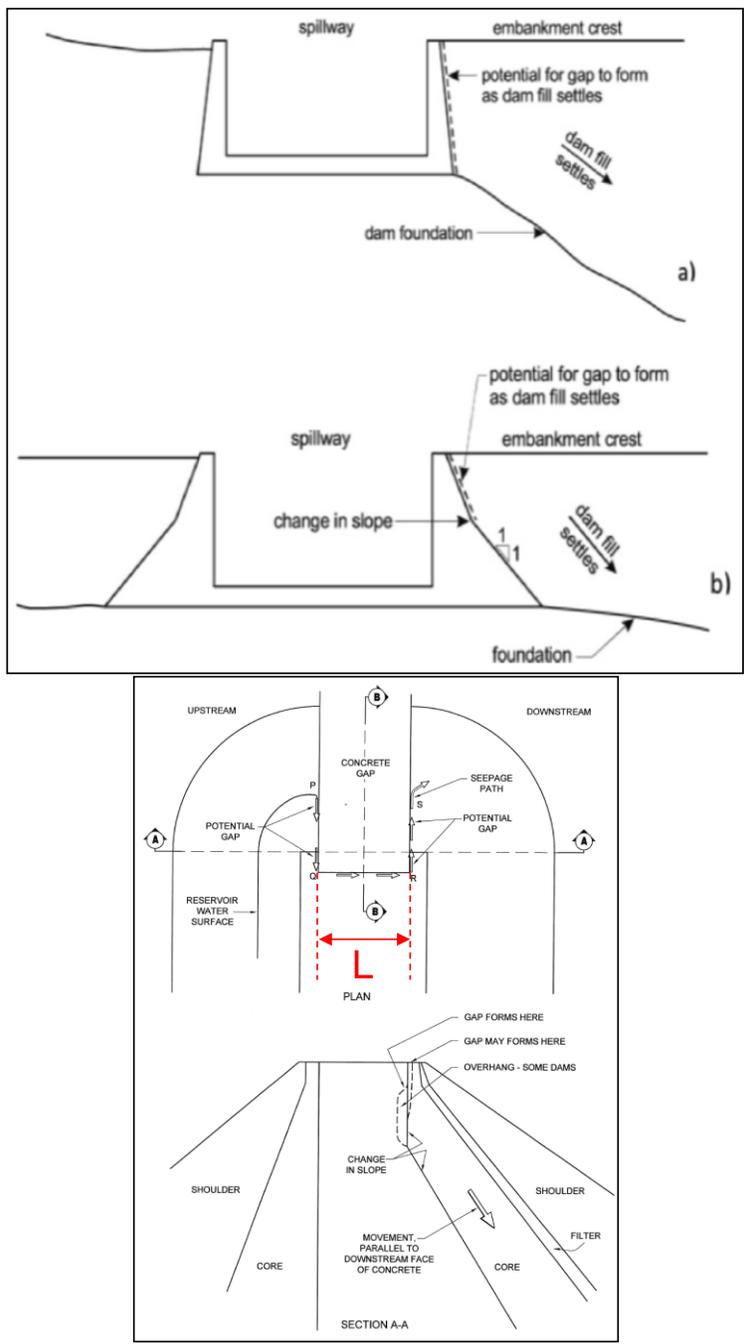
B-9. Crack or Gap adjacent to Spillway or Abutment Walls and Embankment-Concrete Interfaces (Fell et al. 2008)
